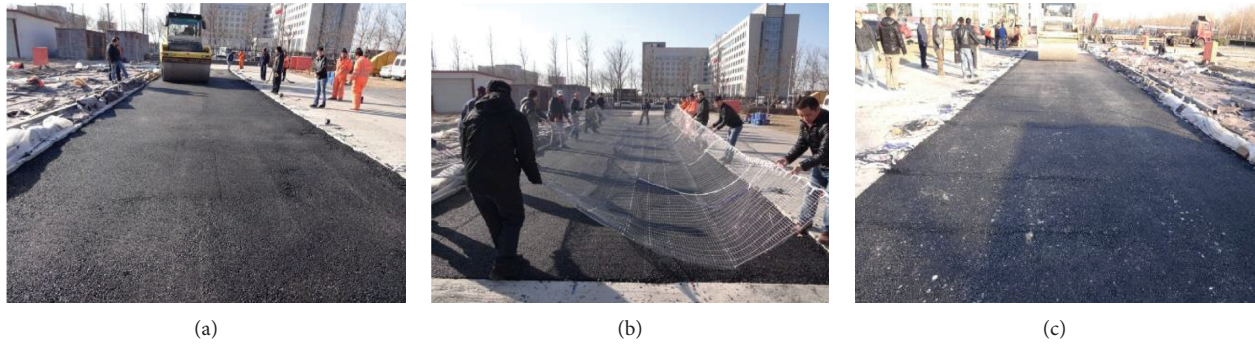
Airport asphalt pavement construction. (a) Lower layer. (b) Heating system layout. (c) Upper layer.
